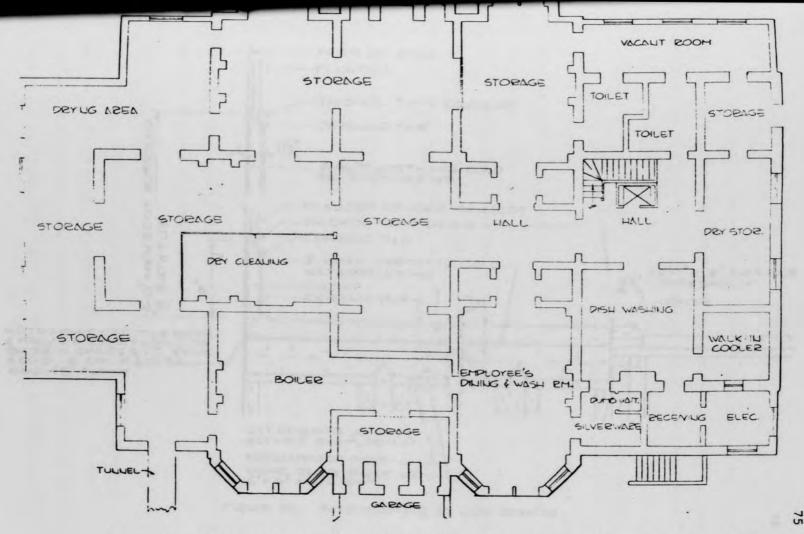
Basement Floor Plan Before 1974-76 Renovation and Partial Restoration
